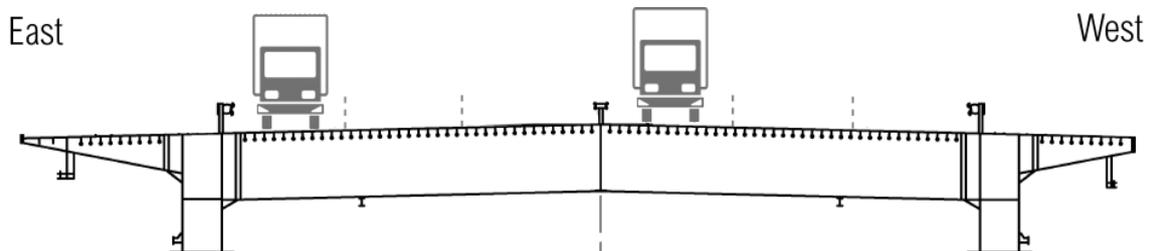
Two separated sections on the eastern Van Brienoord bridge, each with a slow lane [52].
